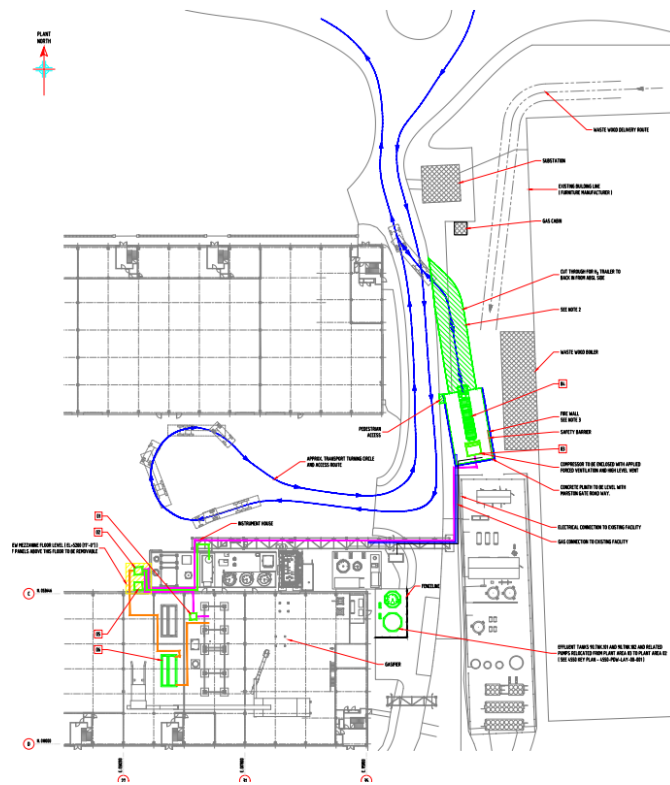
Proposed Biohydrogen GGR Demonstration Layout
